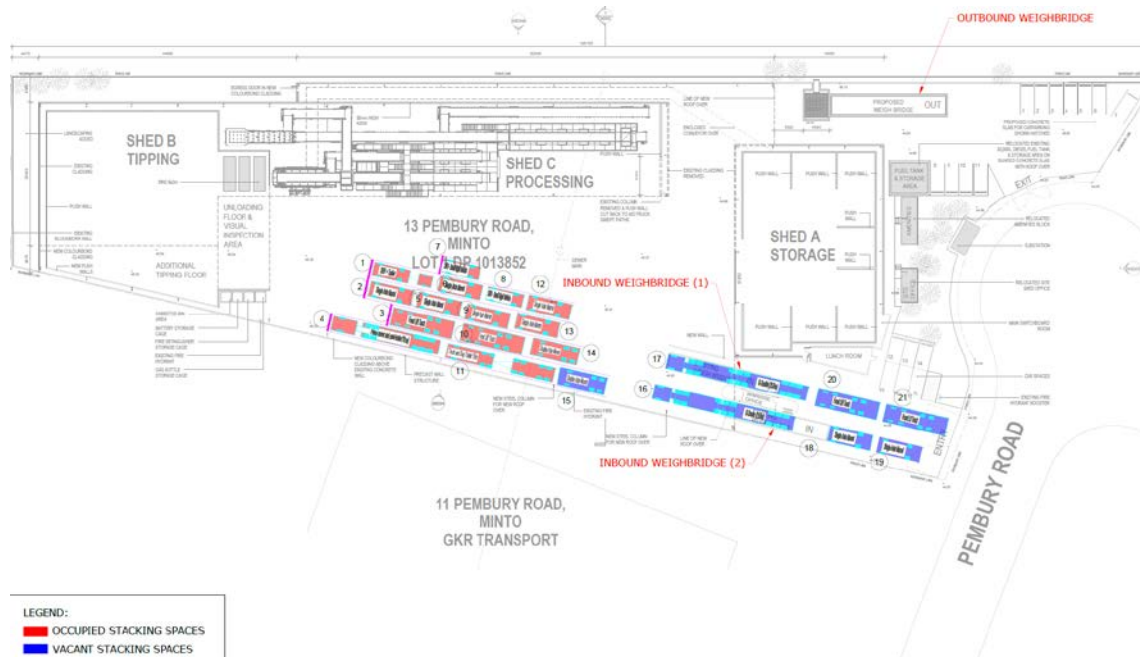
demonstrates that the proposed stacking plan would eliminate any potential queuing on Pembury Road based on current conditions.
